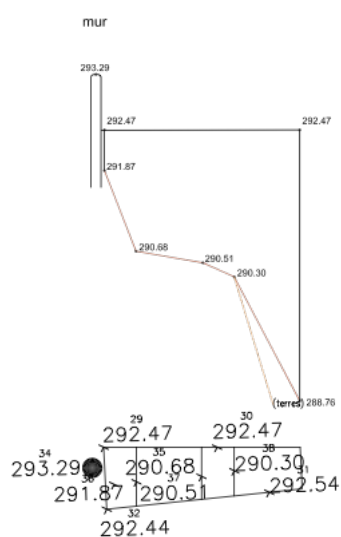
Location of Pit 12 (b) Cross Section of Pit 12
